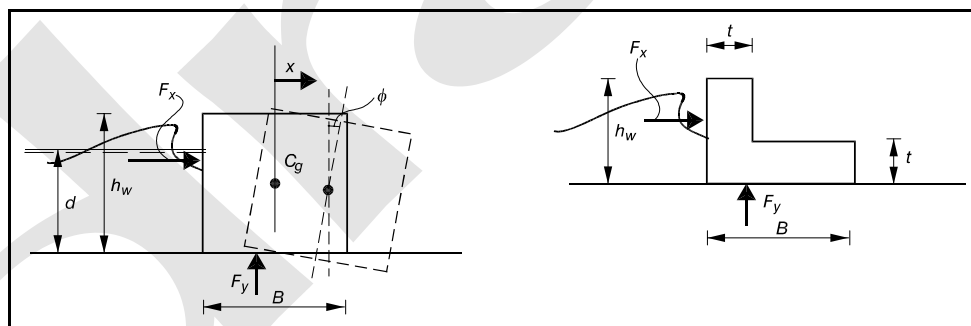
Definition of translatory and rotational motions and dimensions for caisson structure and parapet wave wall exposed to dynamic loading
